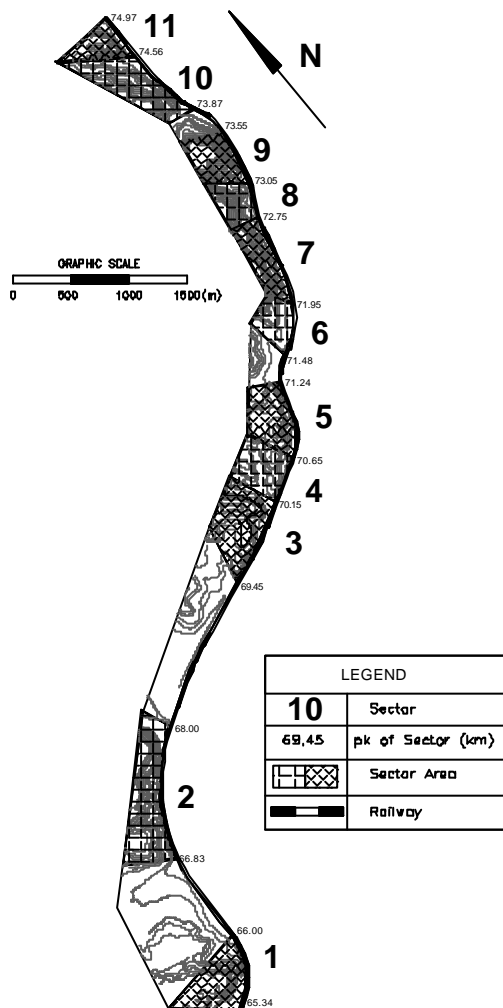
Plan view of the 11 sectors in which the railway segment was divided
